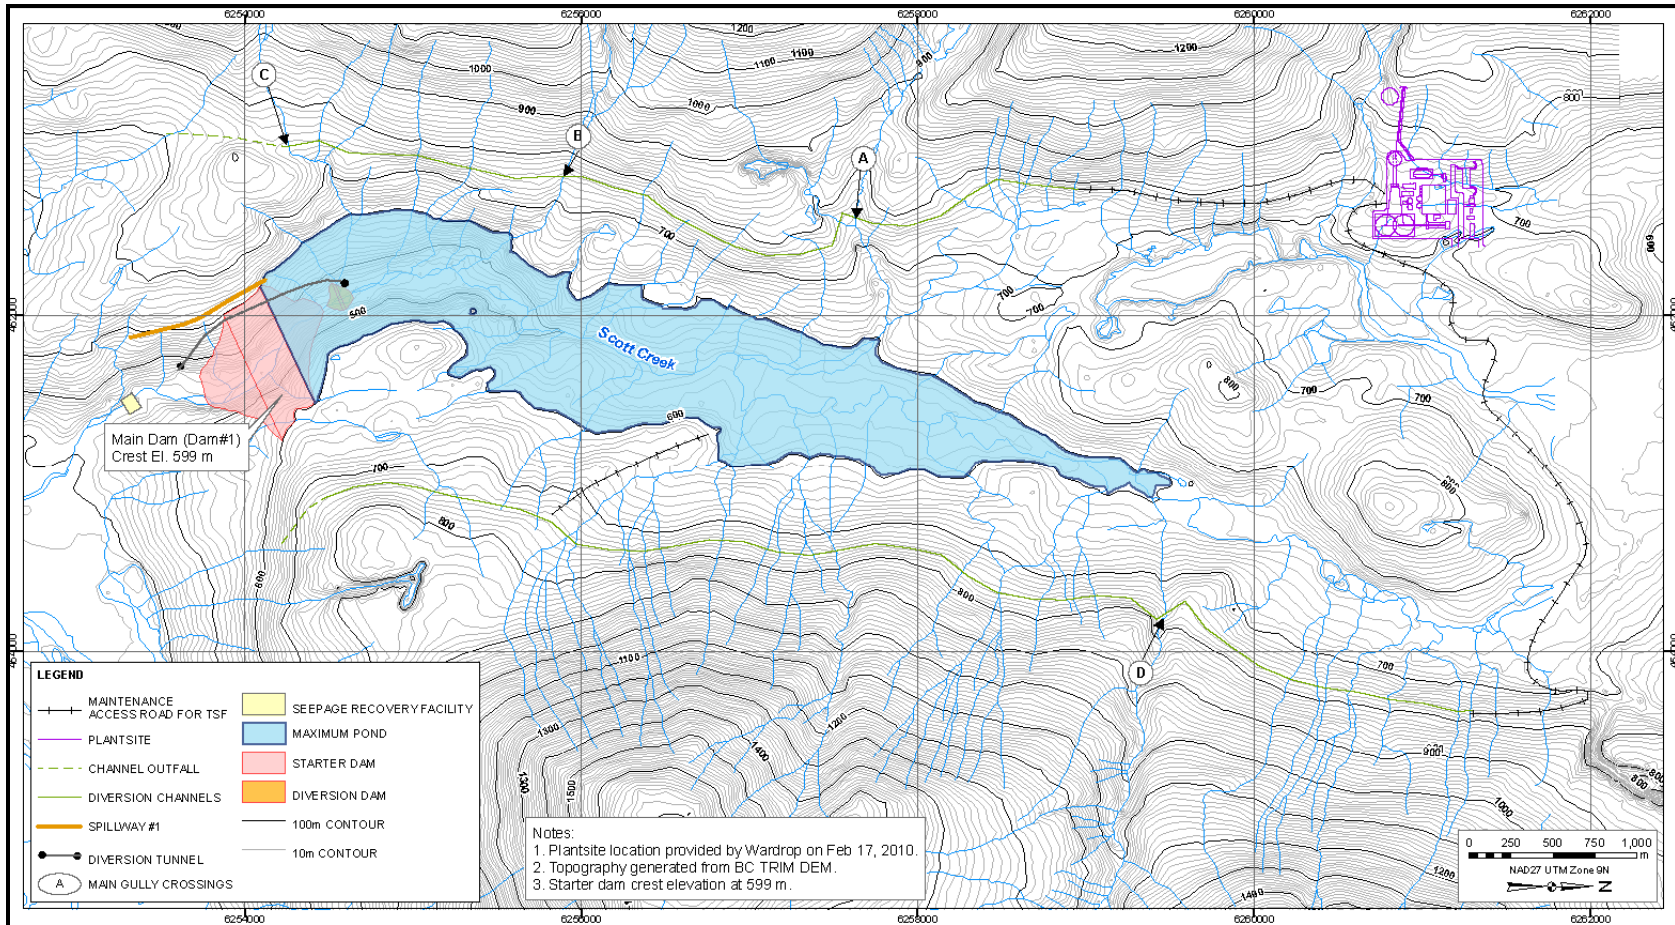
Scott Creek Proposed TSF – Ultimate Dam Layout Plan
